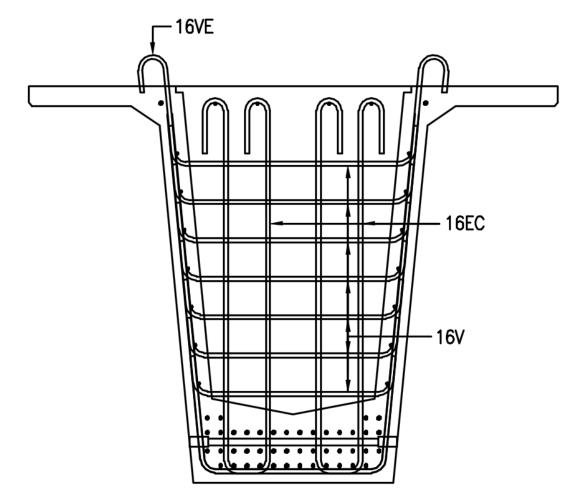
(b) - Typical reinforcing set in diaphragms and around voids (1500 deep girders)
